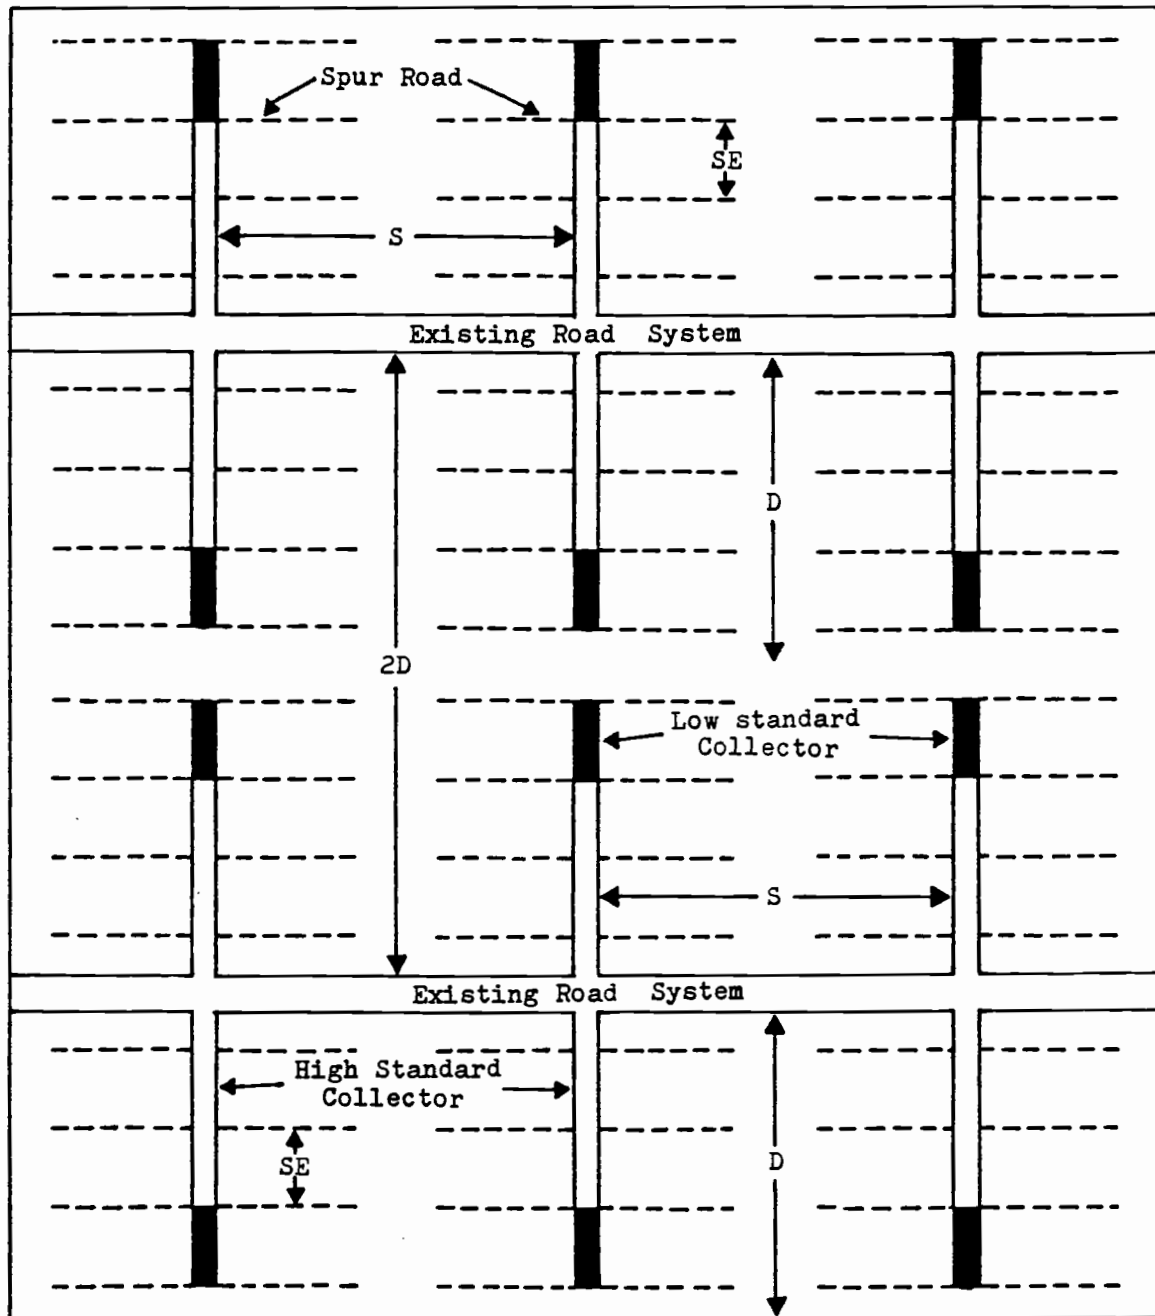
Spacings for the Existing Road System, Collectors and Spur Roads.
